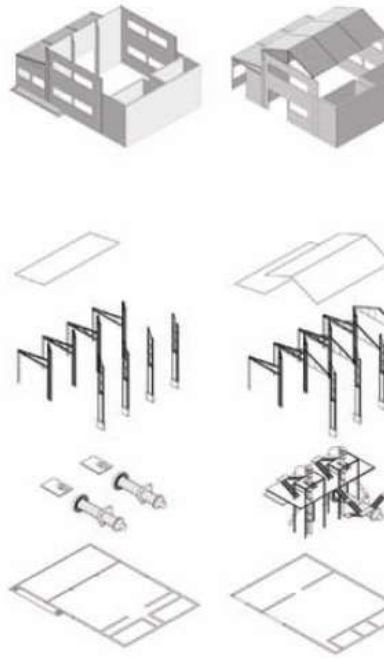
Façades and sections layout of the factory (Al-Shami, 2018). Edited by the author.
